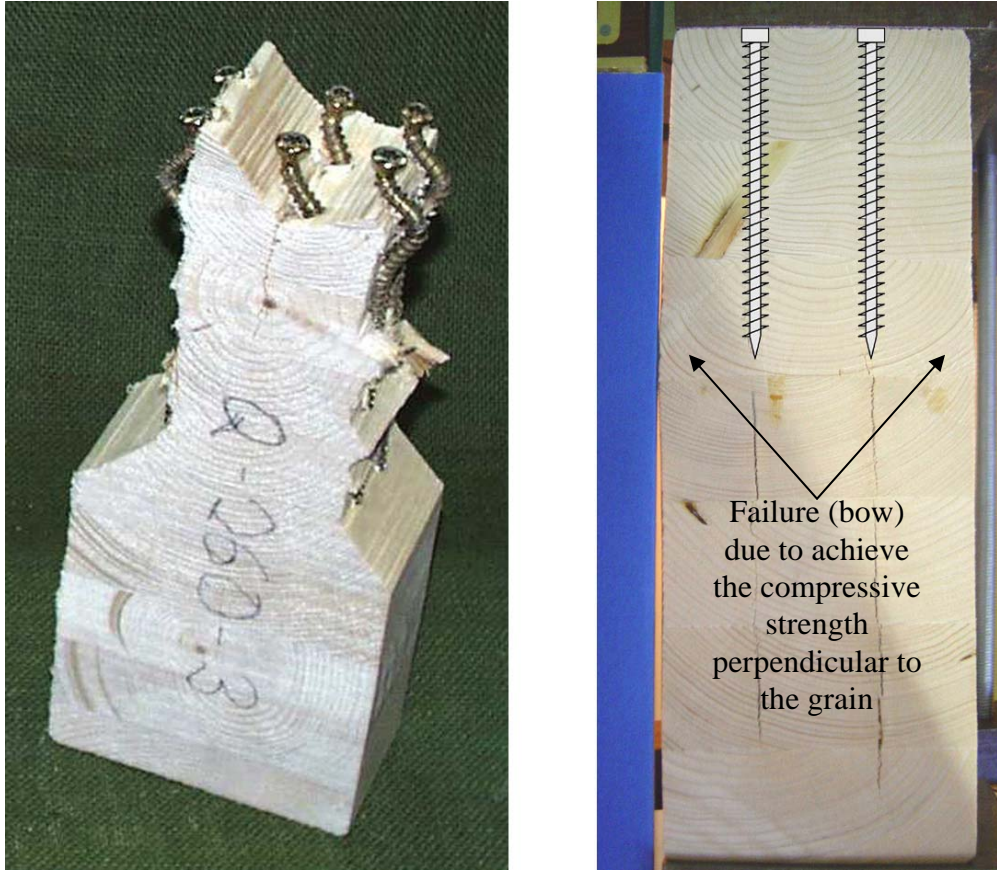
Buckling of the screws and timber failure in a plane formed by the screw tips
